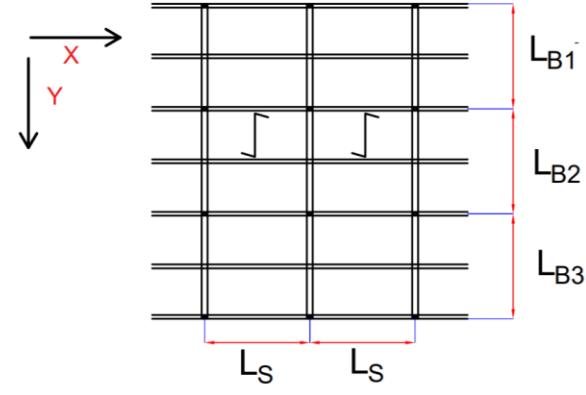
Structural Scheme for Cocoon/Combination Office with Composite Slab floor system.
